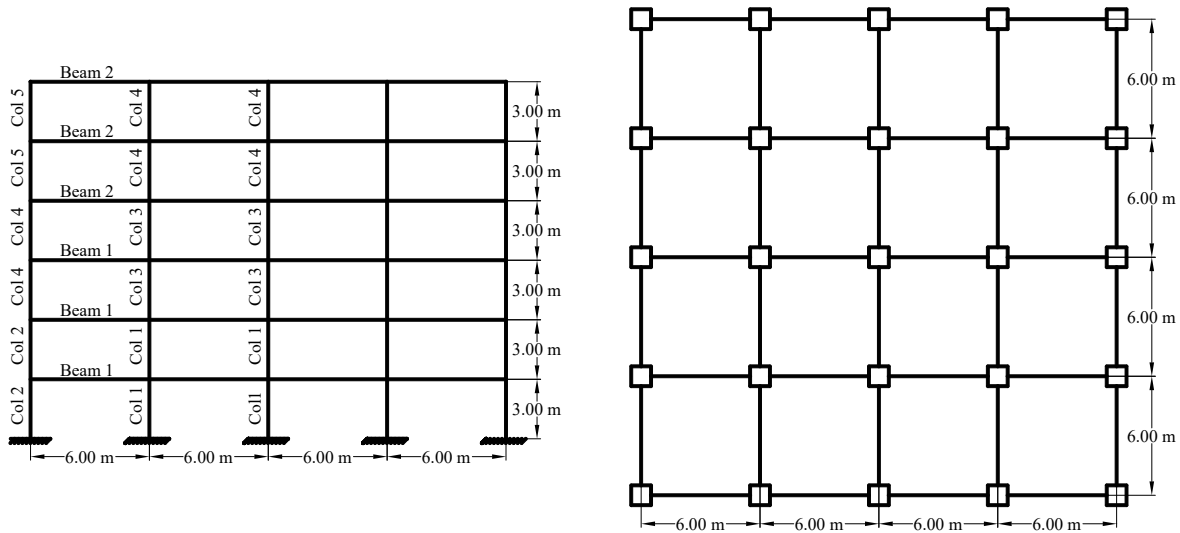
Six-storey RC building Plan and Elevation (Youssef and Elfeki 2012)
